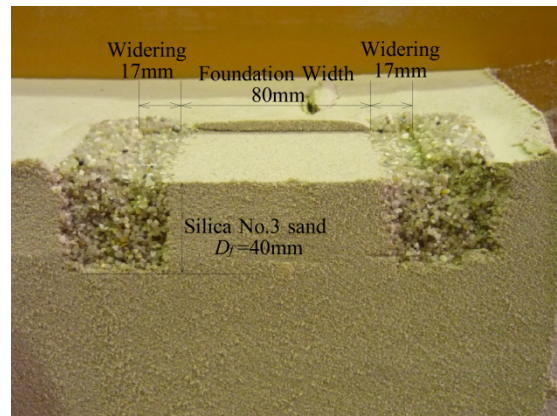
Cross section of the ground post-experiment (NFB-1.2)
